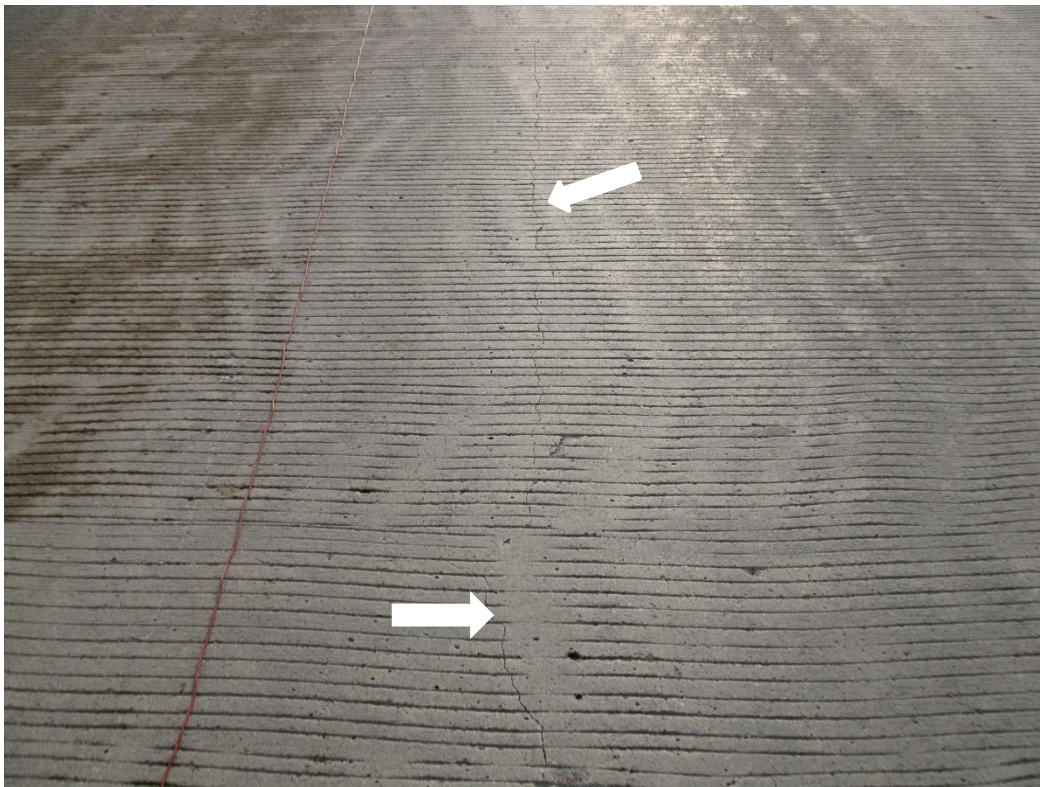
Typical view of longitudinal crack in US 18 bridge deck.
